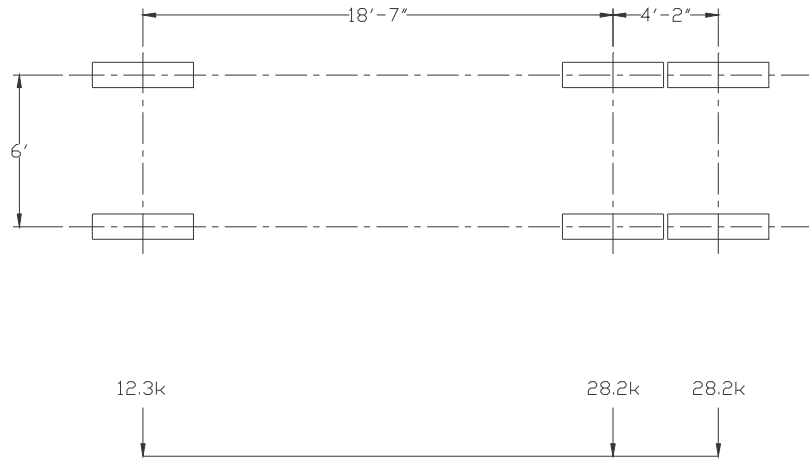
Concrete truck axle loads and spacing – bridge 89-0022
